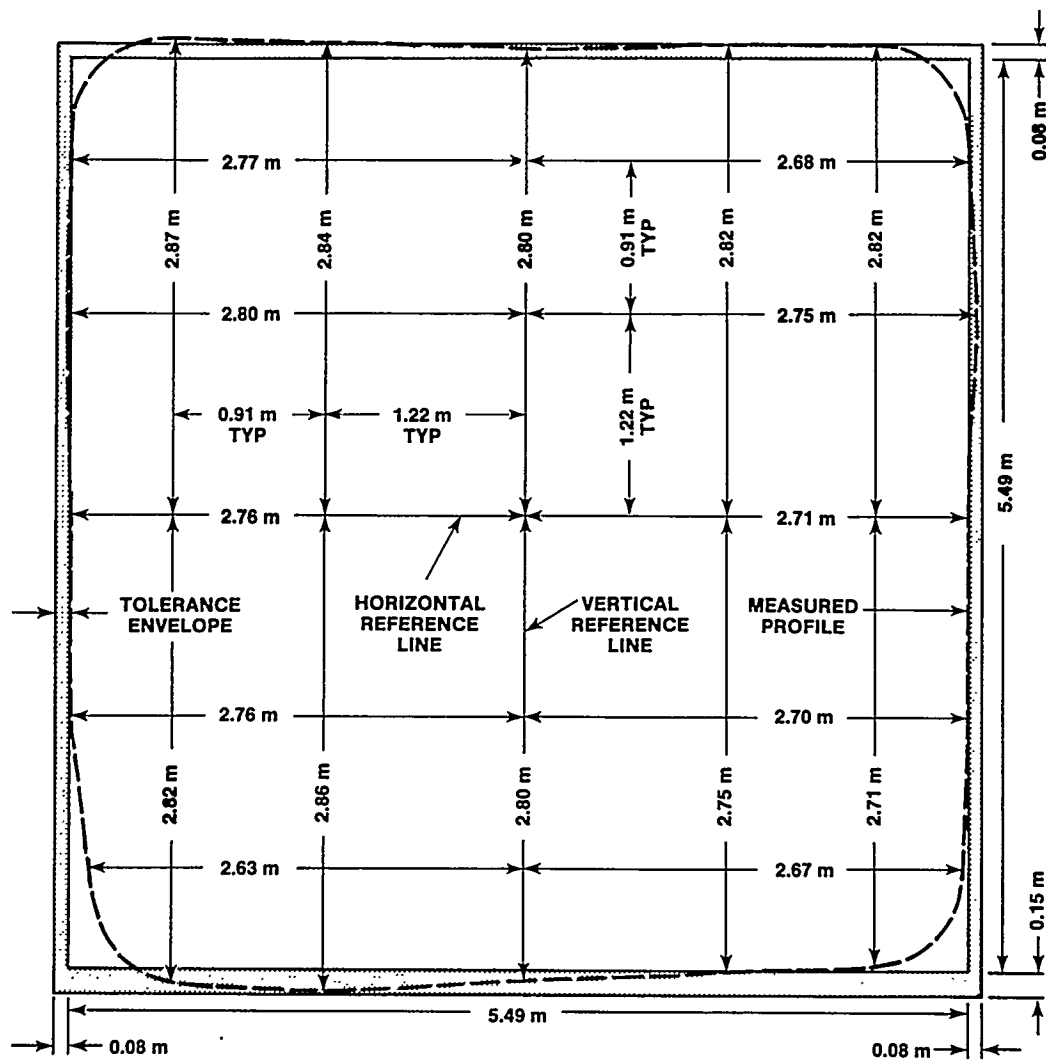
As-Built Cross Section of Station -0.6 m, Room D
